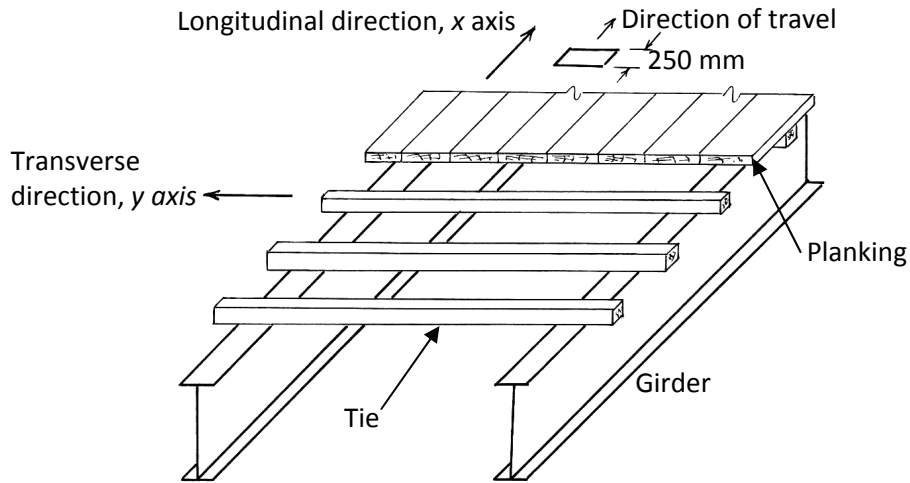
Anatomy and coordinate system for the timber bridge deck
